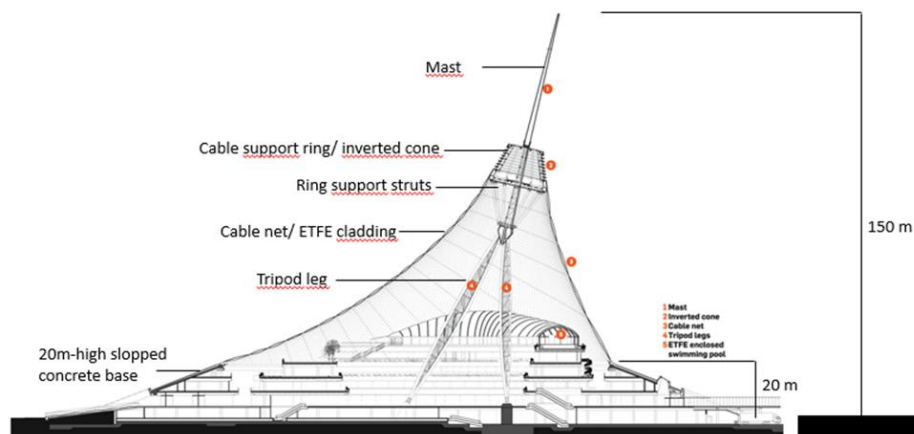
Section through The Khan Shatyr shows structural elements of the building (URL-1)
